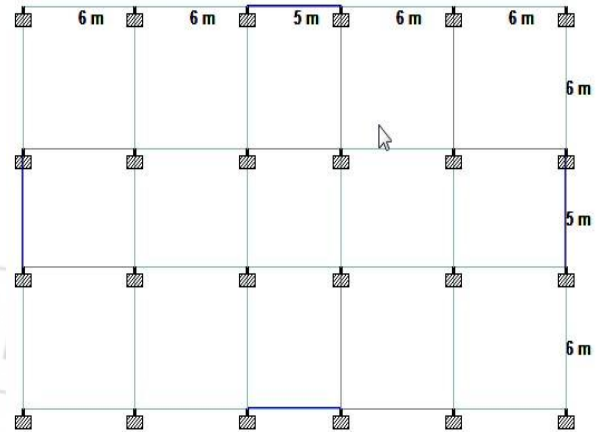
Plan of building frame having Aspect Ratio 0.8 with shear wall (Case Study II)
